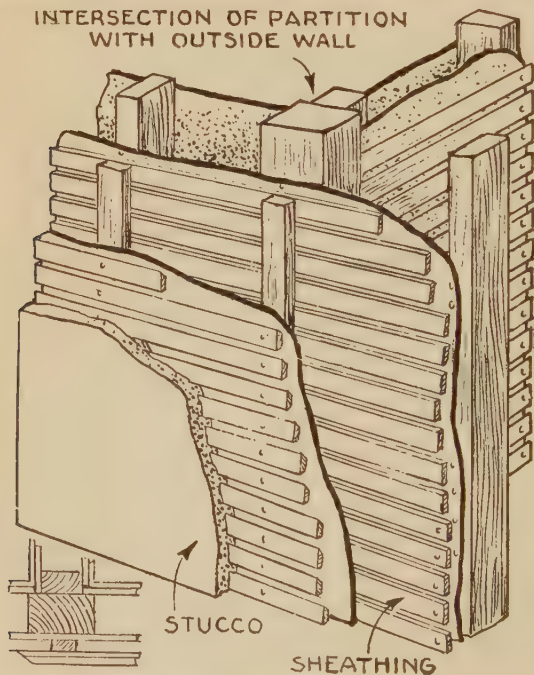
,115 and 5,116.—Stucco applied to new frame building. 3, over two layer horizontal strips (so called wooden lath).
